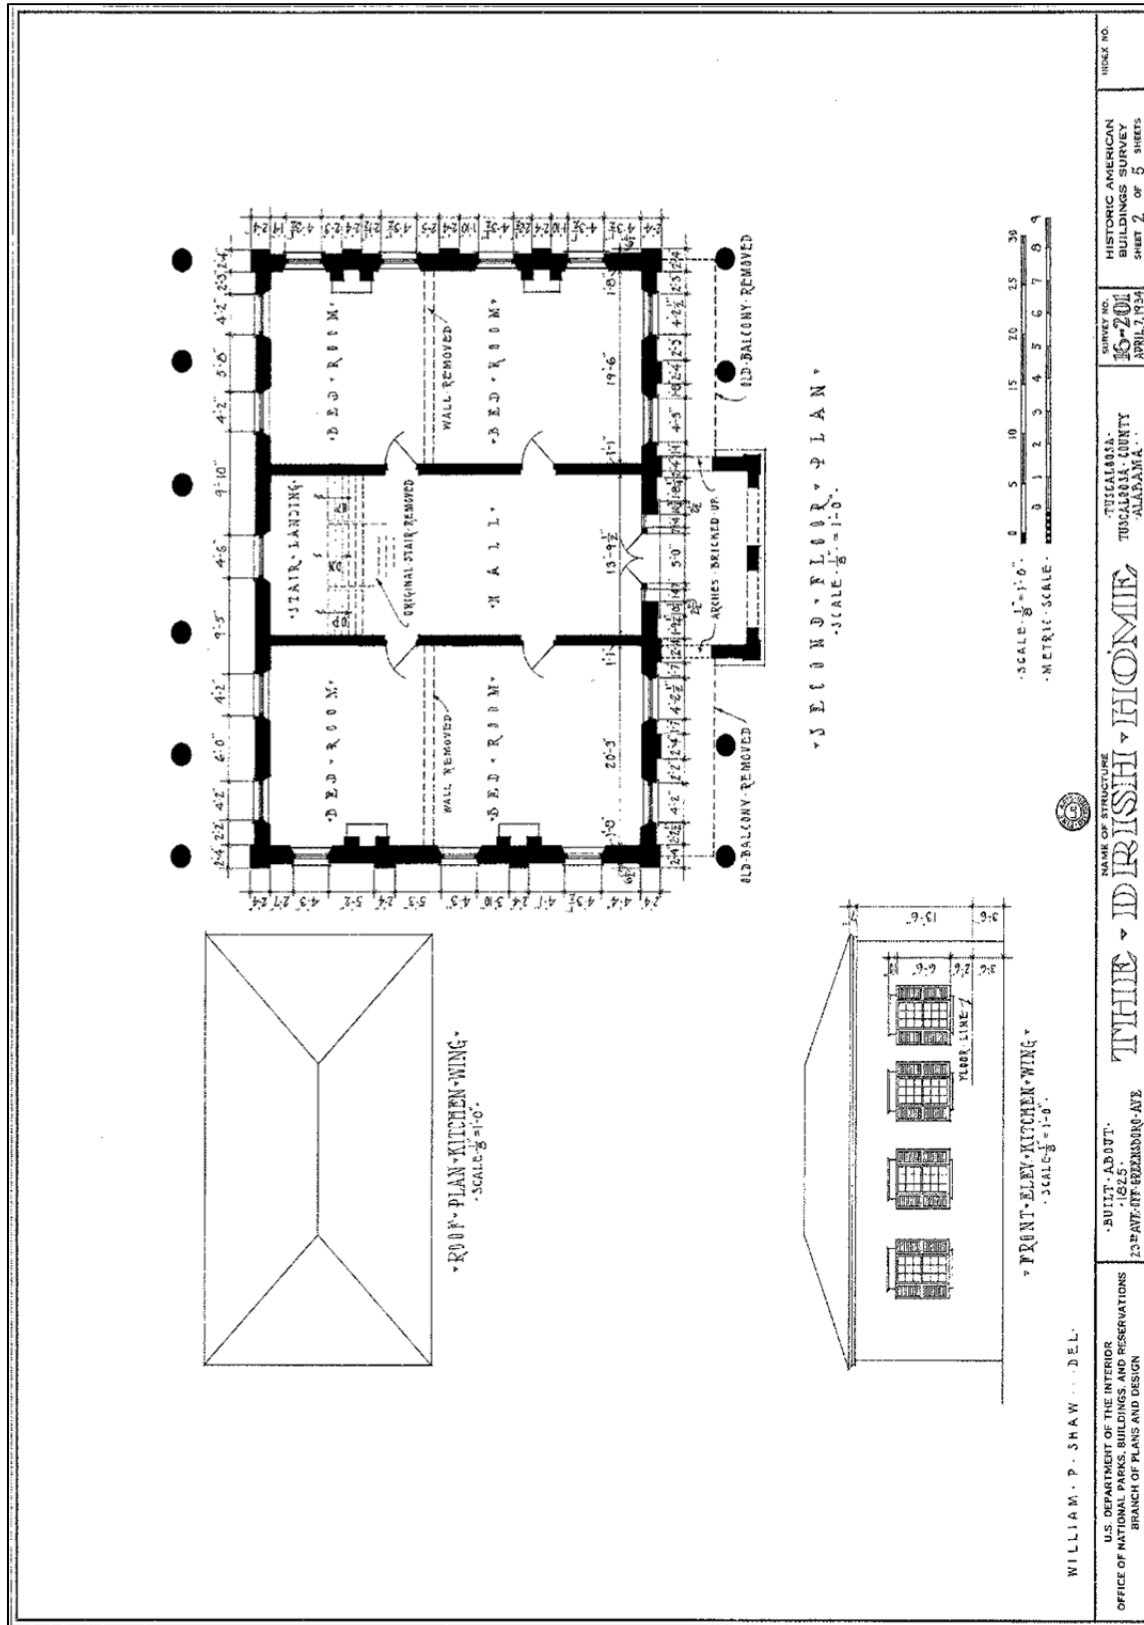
HABS Second Floor Plan, The Drish Home (HABS 1934).
